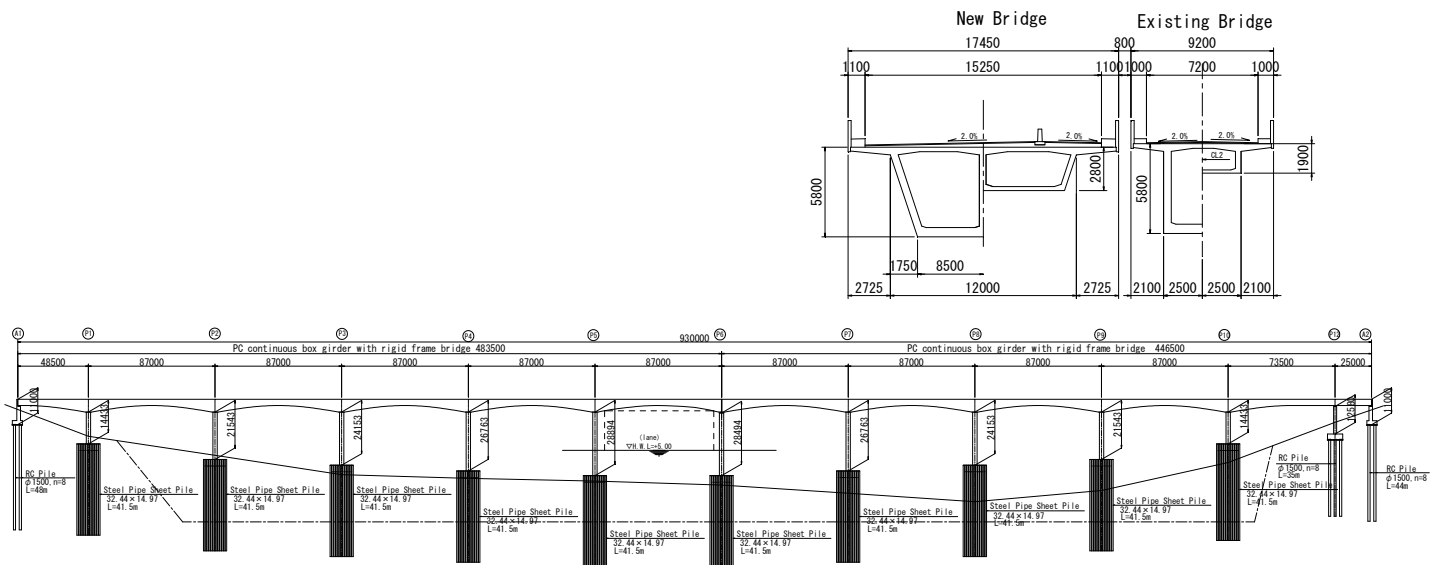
Cross-Section and Side View of Option-1 (Meghna Bridge)
